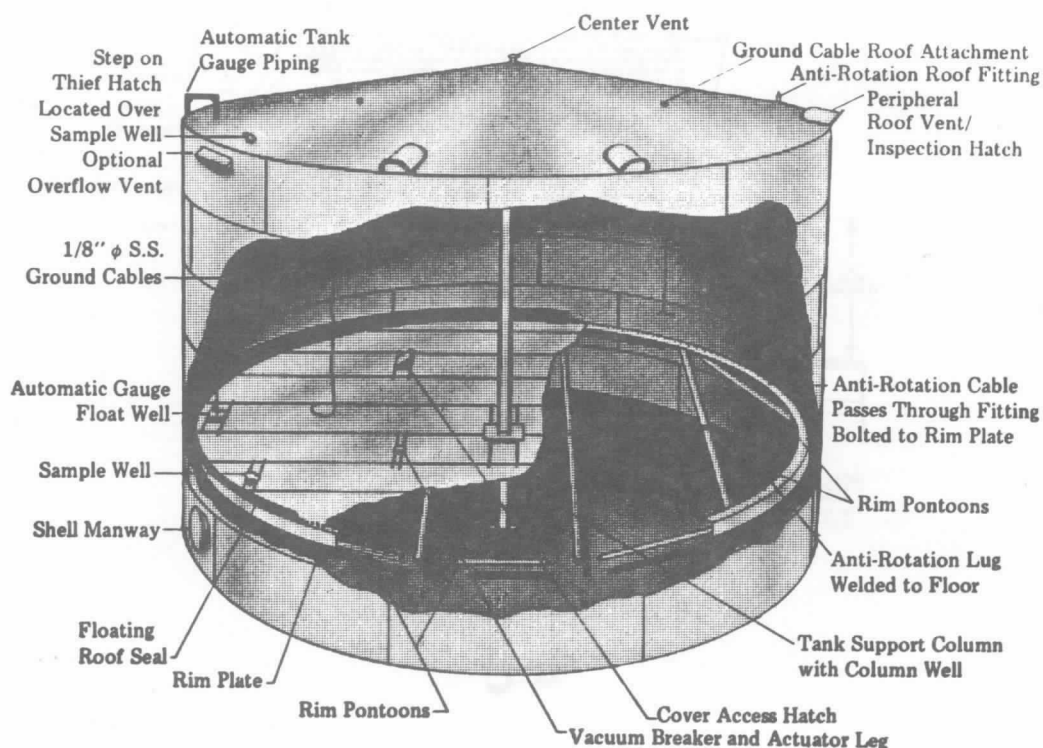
Typical Covered Floating Roof Tank.
